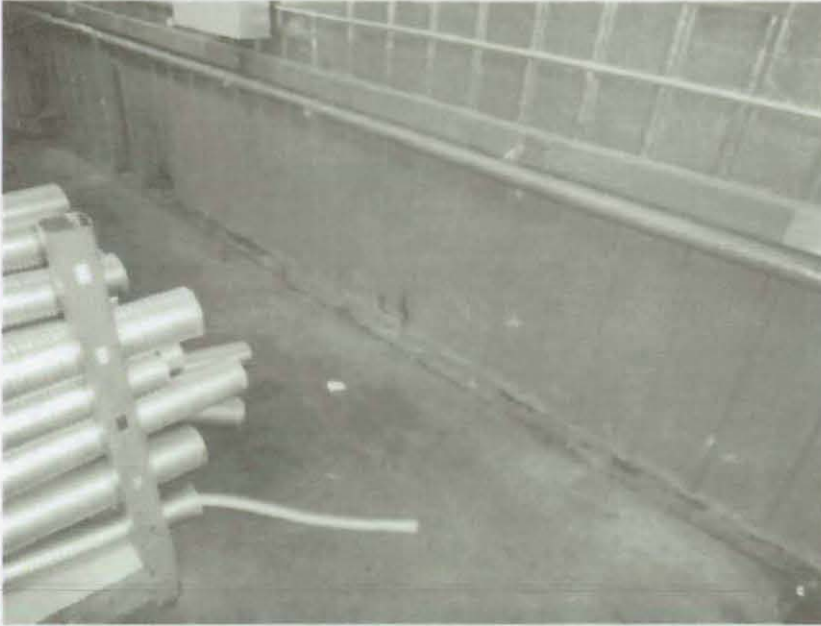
South side of wall. Burned siding near floor is location of column base plates at columns added after the fire.
